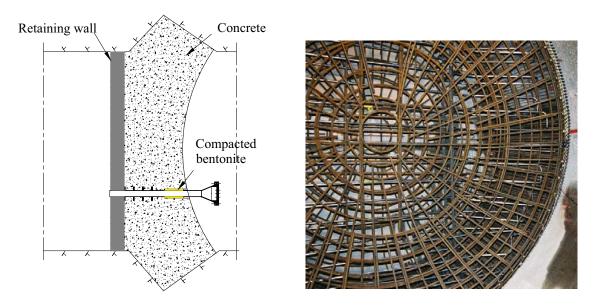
Schematic drawing of the concrete plug (left) and the reinforcement (right).
